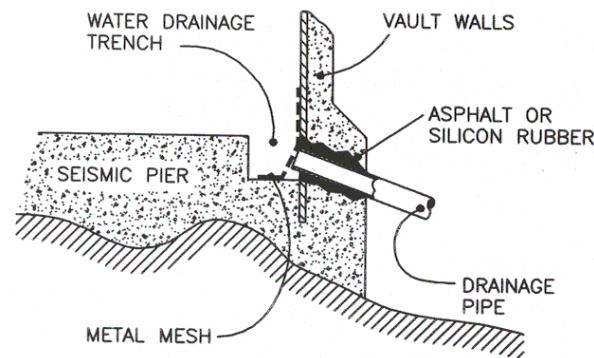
Water drainage pipe and vault trench around the seismic pier.
